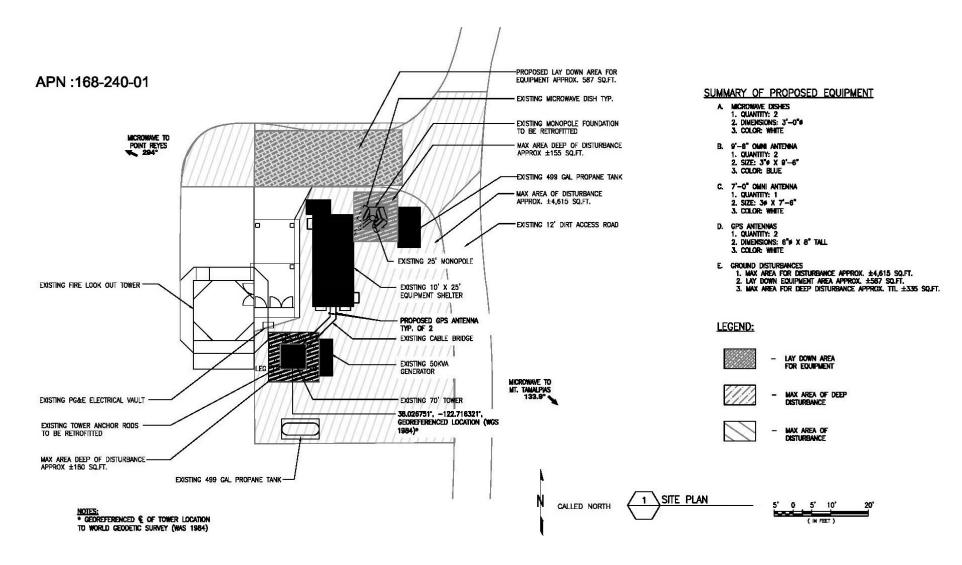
Site 5 - Mt. Barnabe Site Plan
